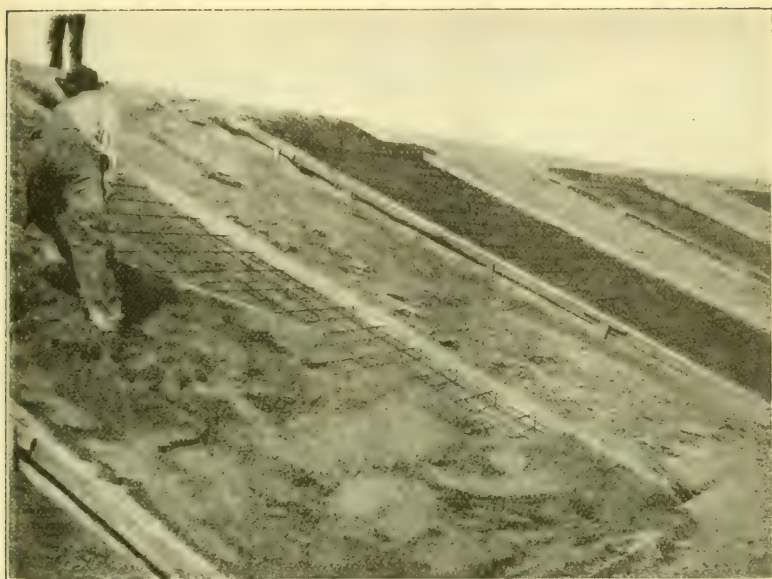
PLACING CONCRETE PROTECTION SLABS ON FACE OF RESERVOIR EMBANKMENT.
